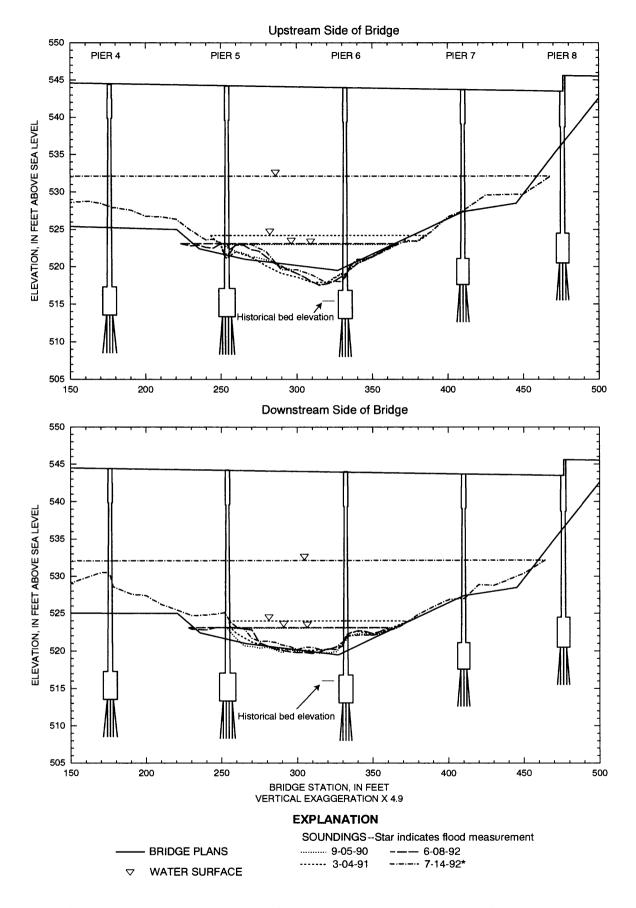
Cross sections showing bed elevations from bridge plans and soundings, State Road 25 over Wildcat Creek at Lafayette, Indiana.
